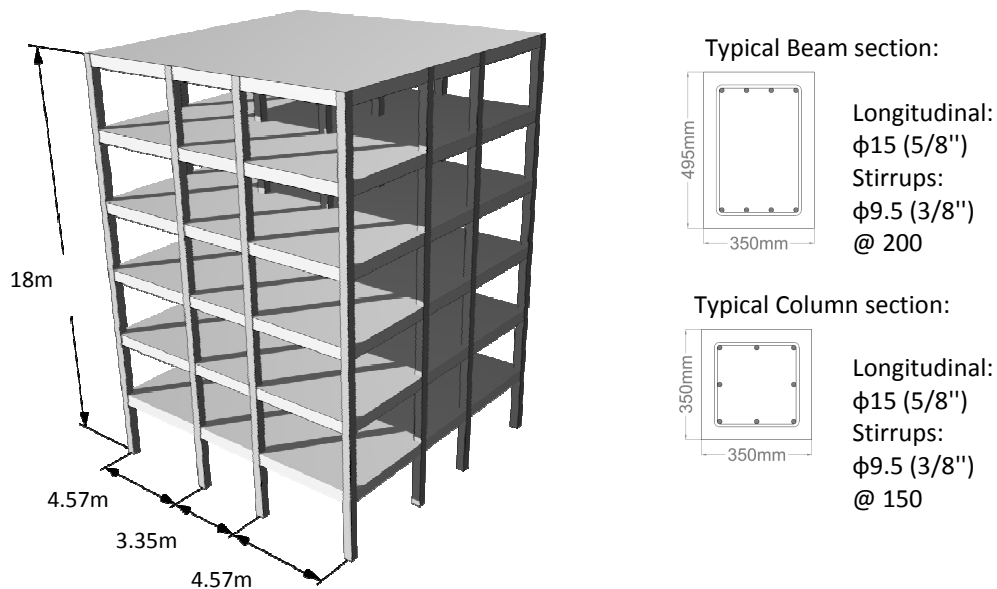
Geometry and structural details for the case study RC frame building (modified after Kam, 2010)
